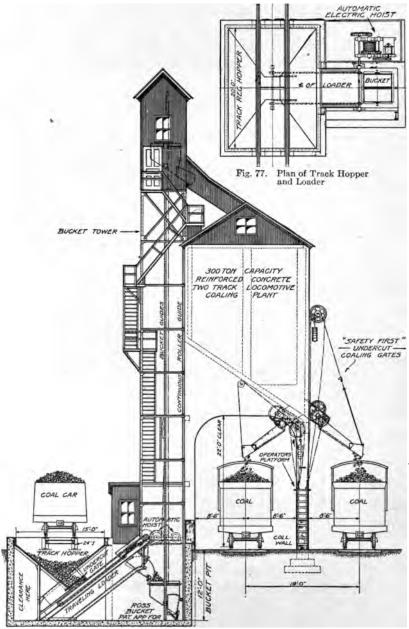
300-Ton Reinforced Concrete Locomotive Coaling Plant, Provided with "Duplex" Shallow Pit Loader.
